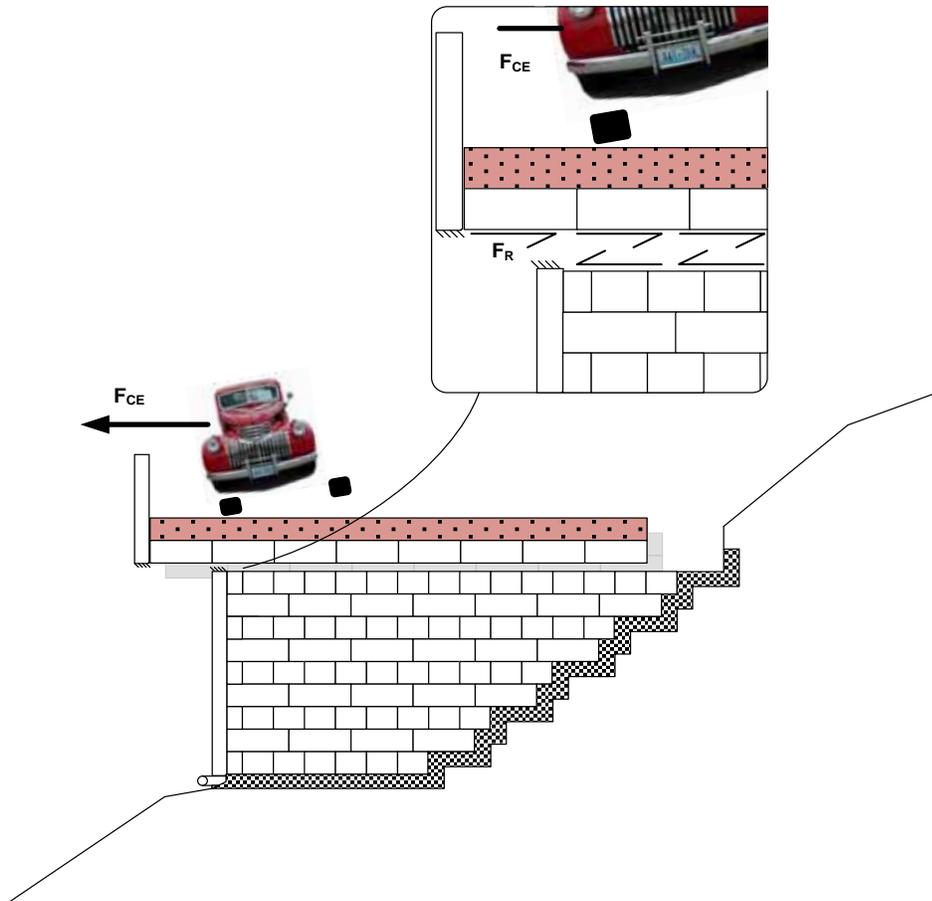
Cross-section view of model used to evaluate horizontal sliding due to centrifugal forces.
